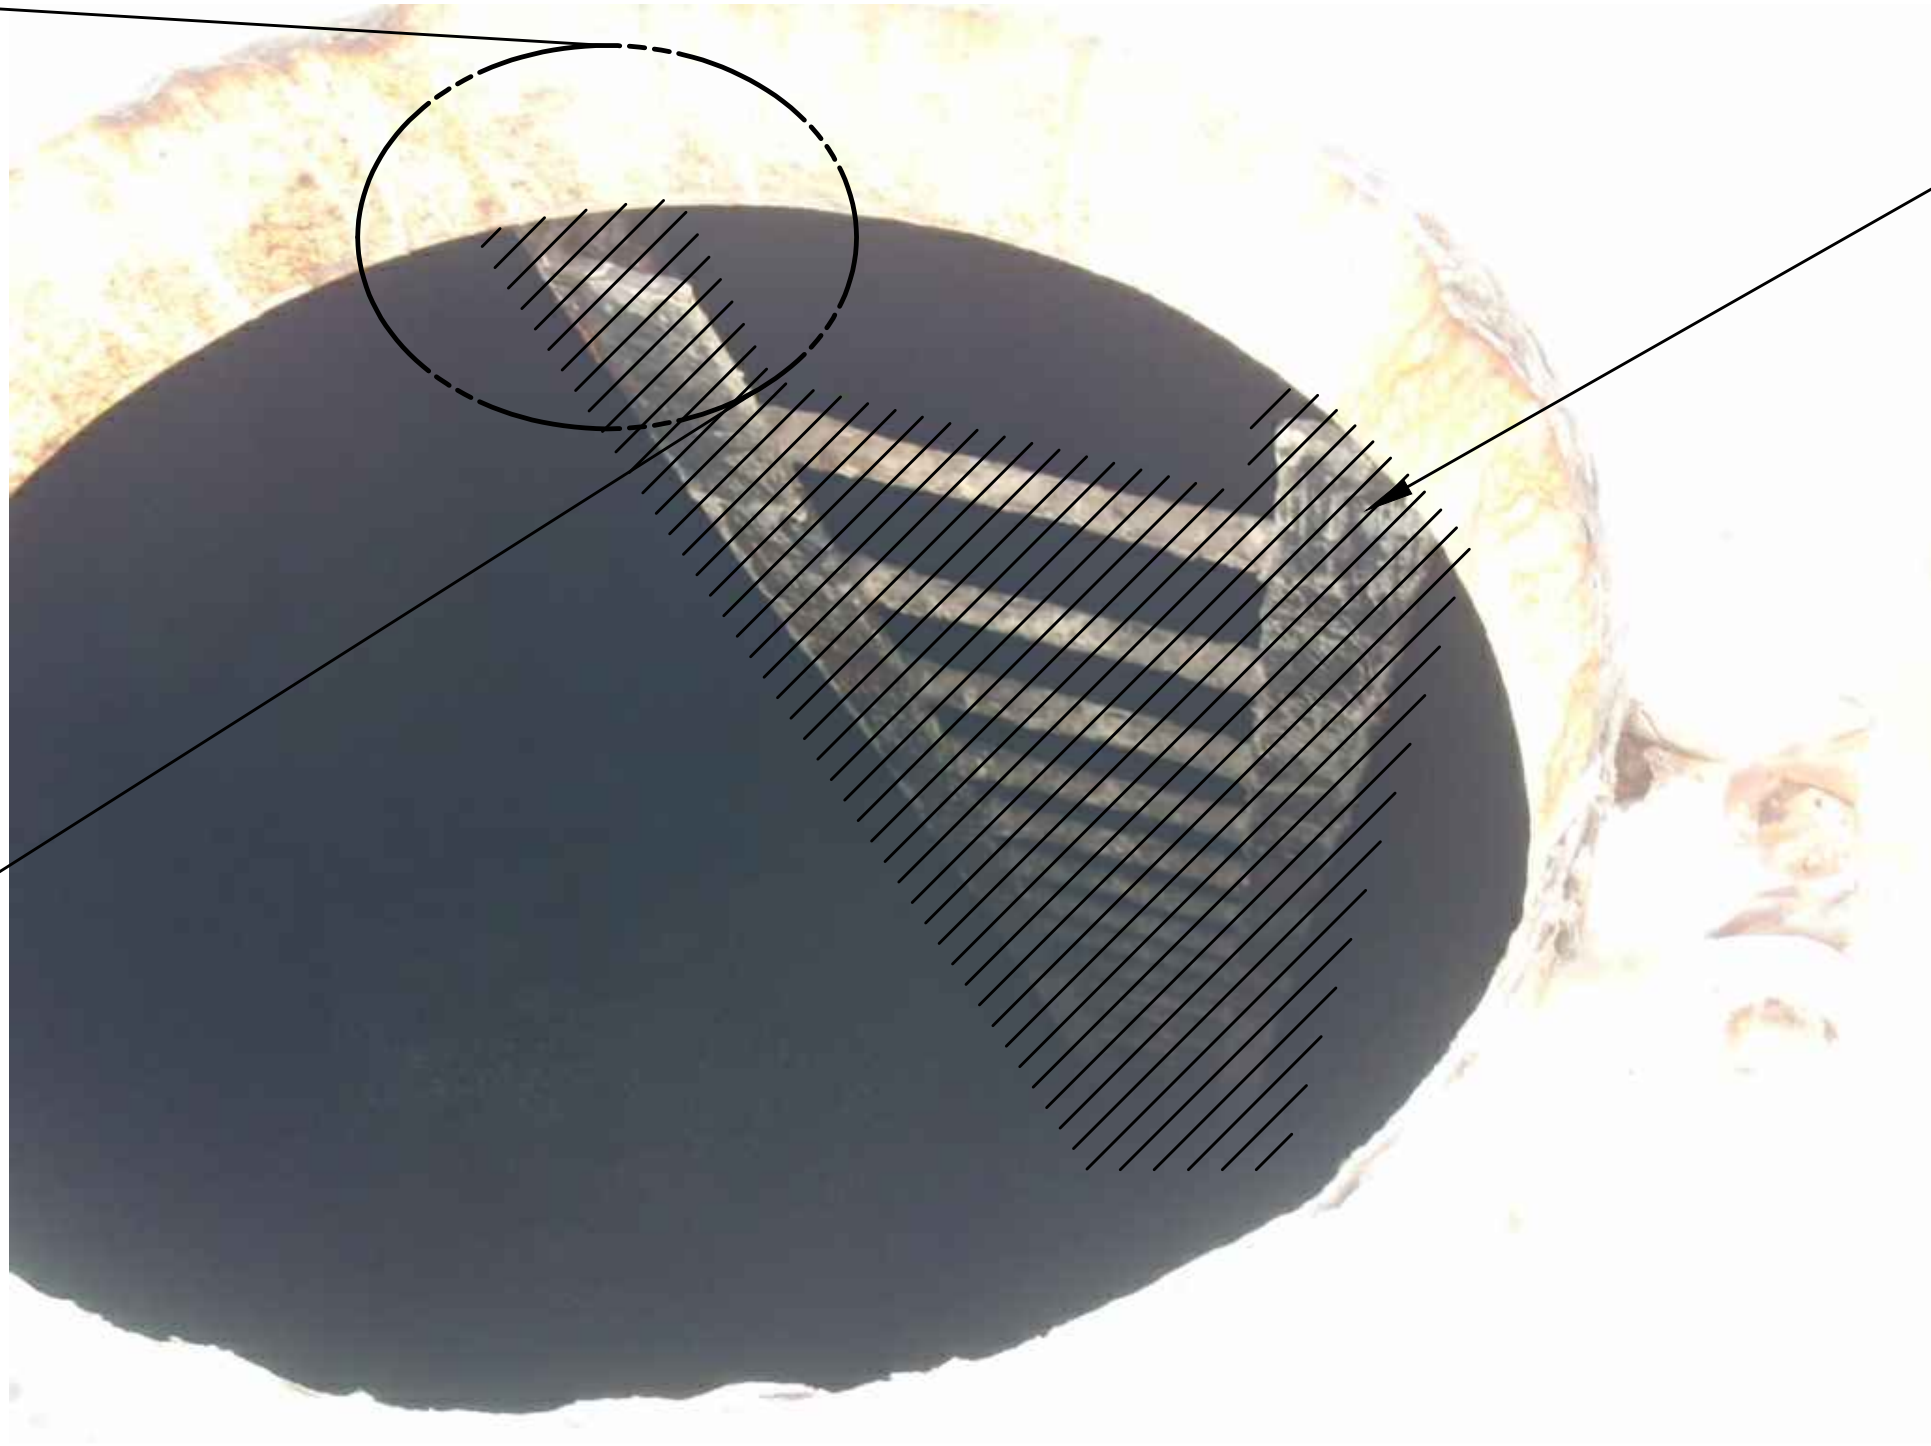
TANK INTERIOR LADDER AT ROOF ACCESS HATCH
